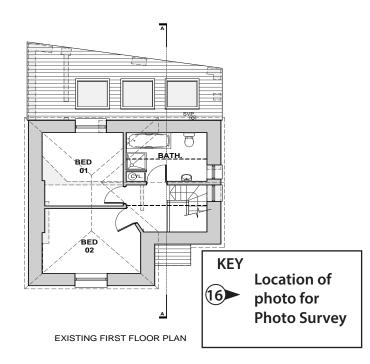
Reproduction of Matthew Jones Architects Drawing Nos. AL-3141-09/21-SU02 & Interior Photo Location Plan.
